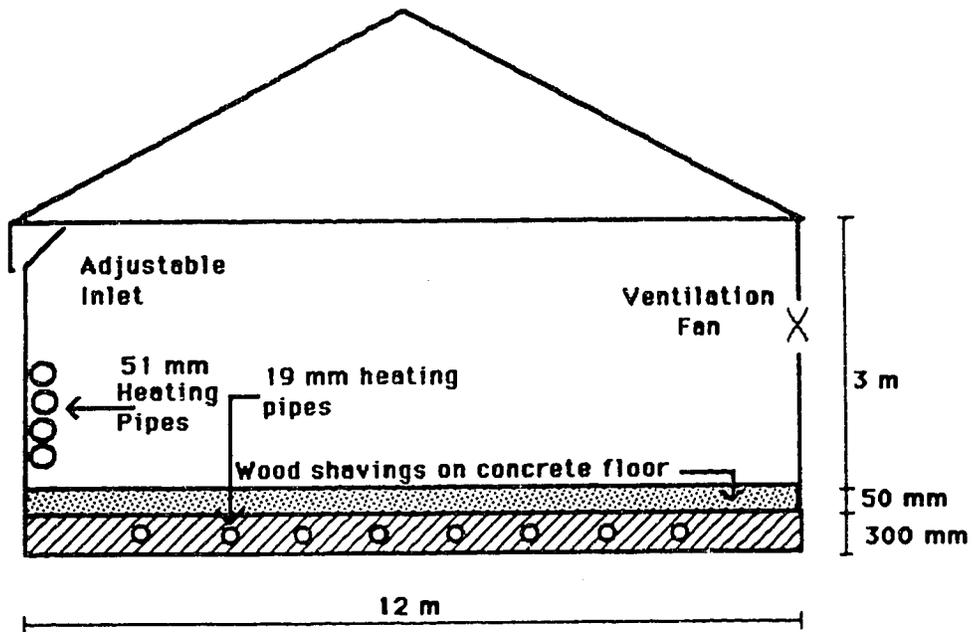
Cross-sectional view of the brooder barn showing heating pipes and inlet location (not to scale).
